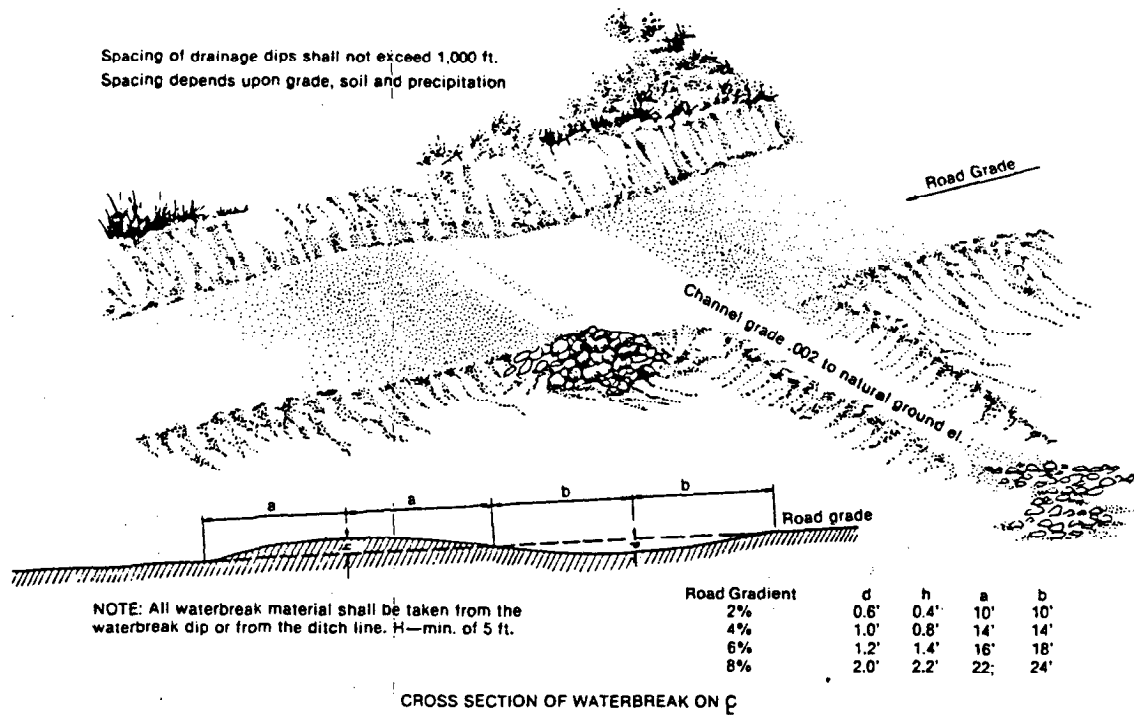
"Thank-u-Mam" for Slight to Moderate Slope for Access Roads
